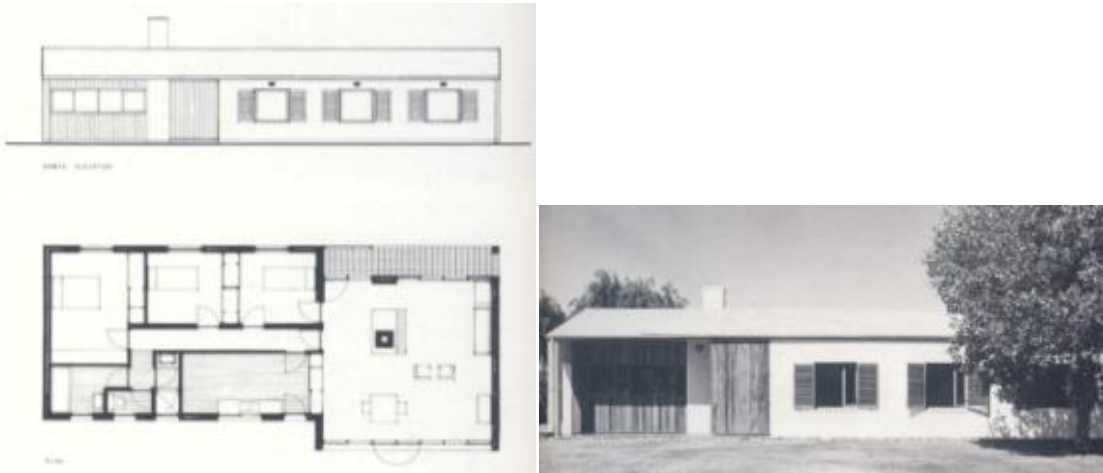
Left: Elevation and plan of House Droomer, Worcester, Western Cape (1955) (Fox,1998:84). Right: Garden view to House Droomer (Fox,1998:85).
